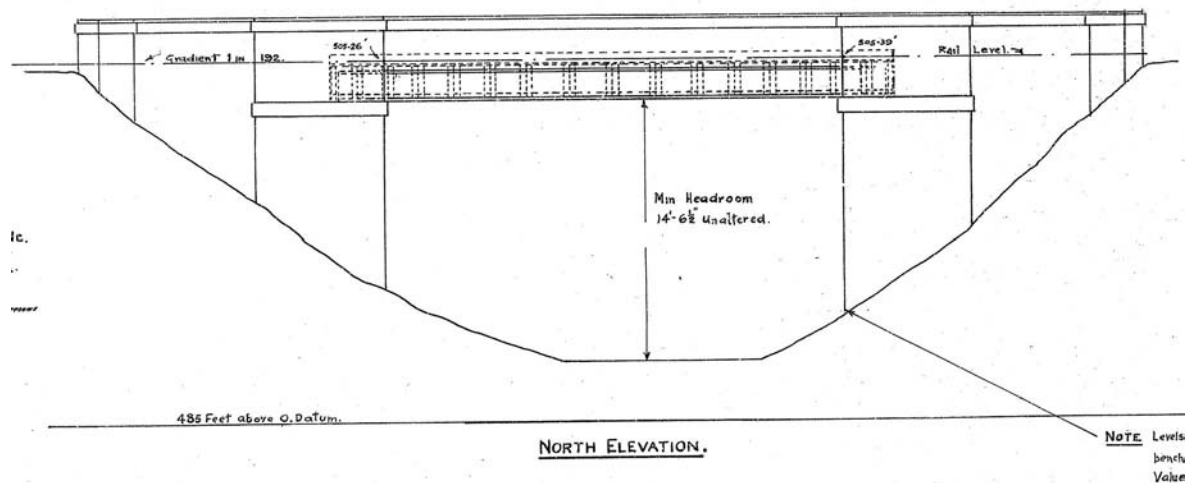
Bridge 34 - original Skimpot Road bridge (demolished), north elevation.
